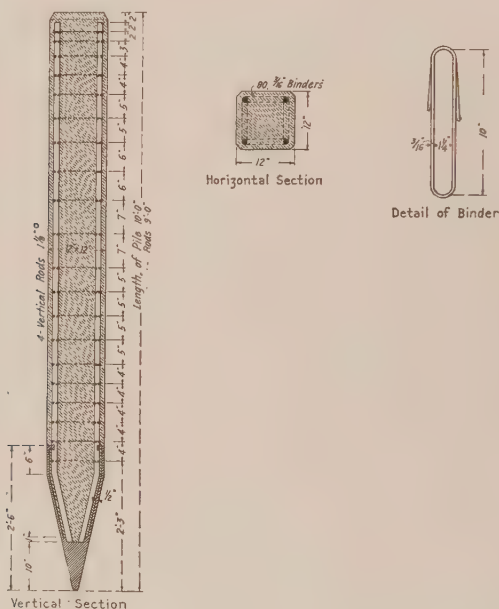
SQUARE (UNPATENTED) REINFORCED-CONCRETE PILE, USING STEEL PROTECTING POINT.
